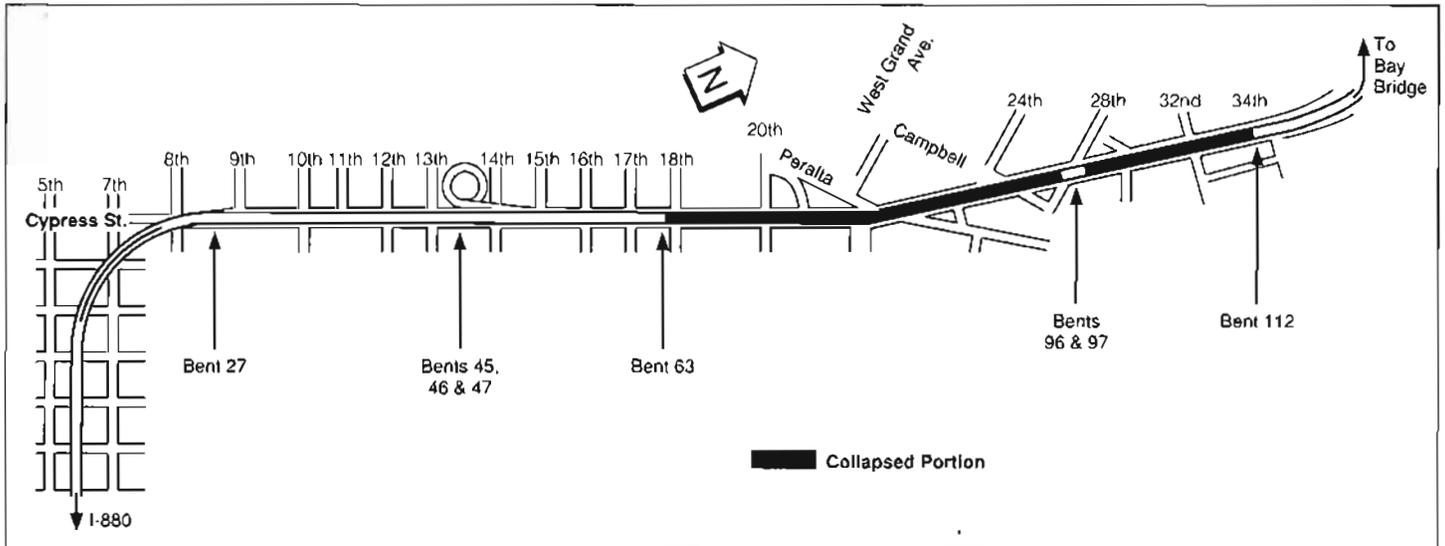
Plan of Cypress Viaduct showing damaged bents and undamaged bents.
